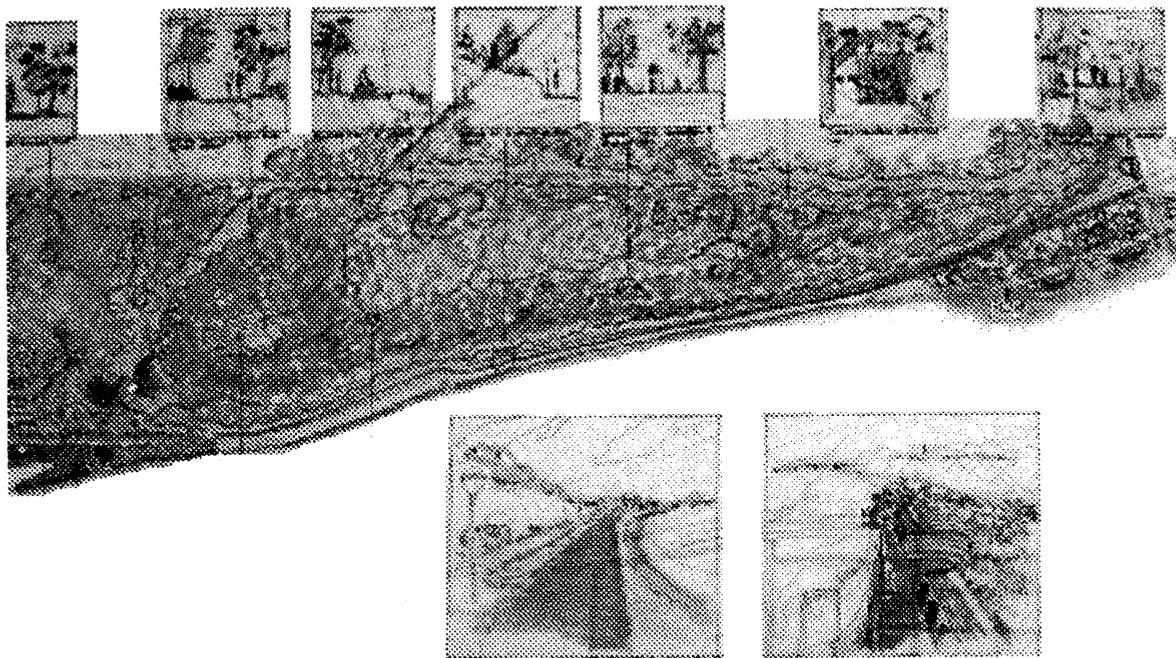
Plan showing design for Turkey Mountain and Southside Sewage Treatment Plant.
